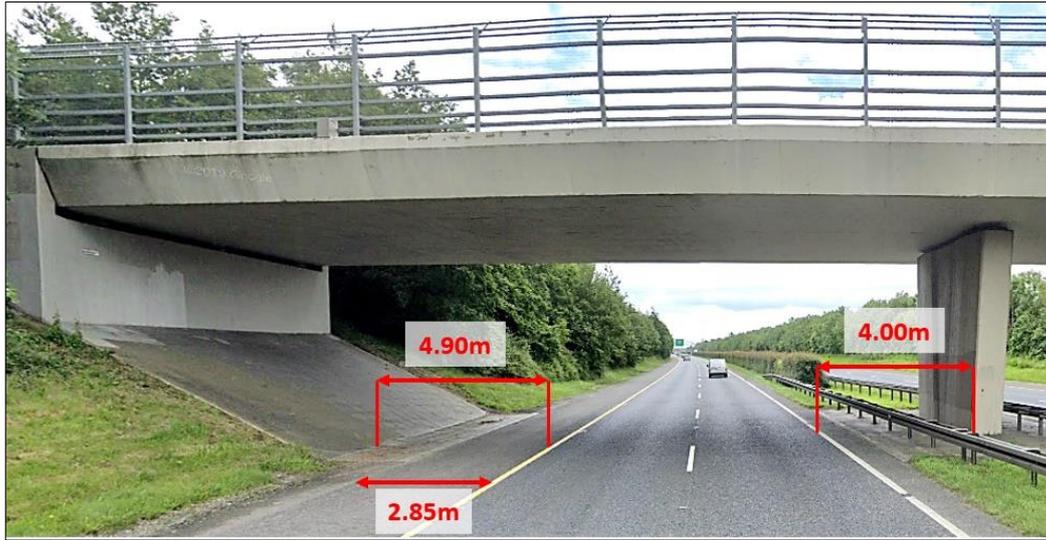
R404 Celbridge Road Overbridge (©2021 Google)
